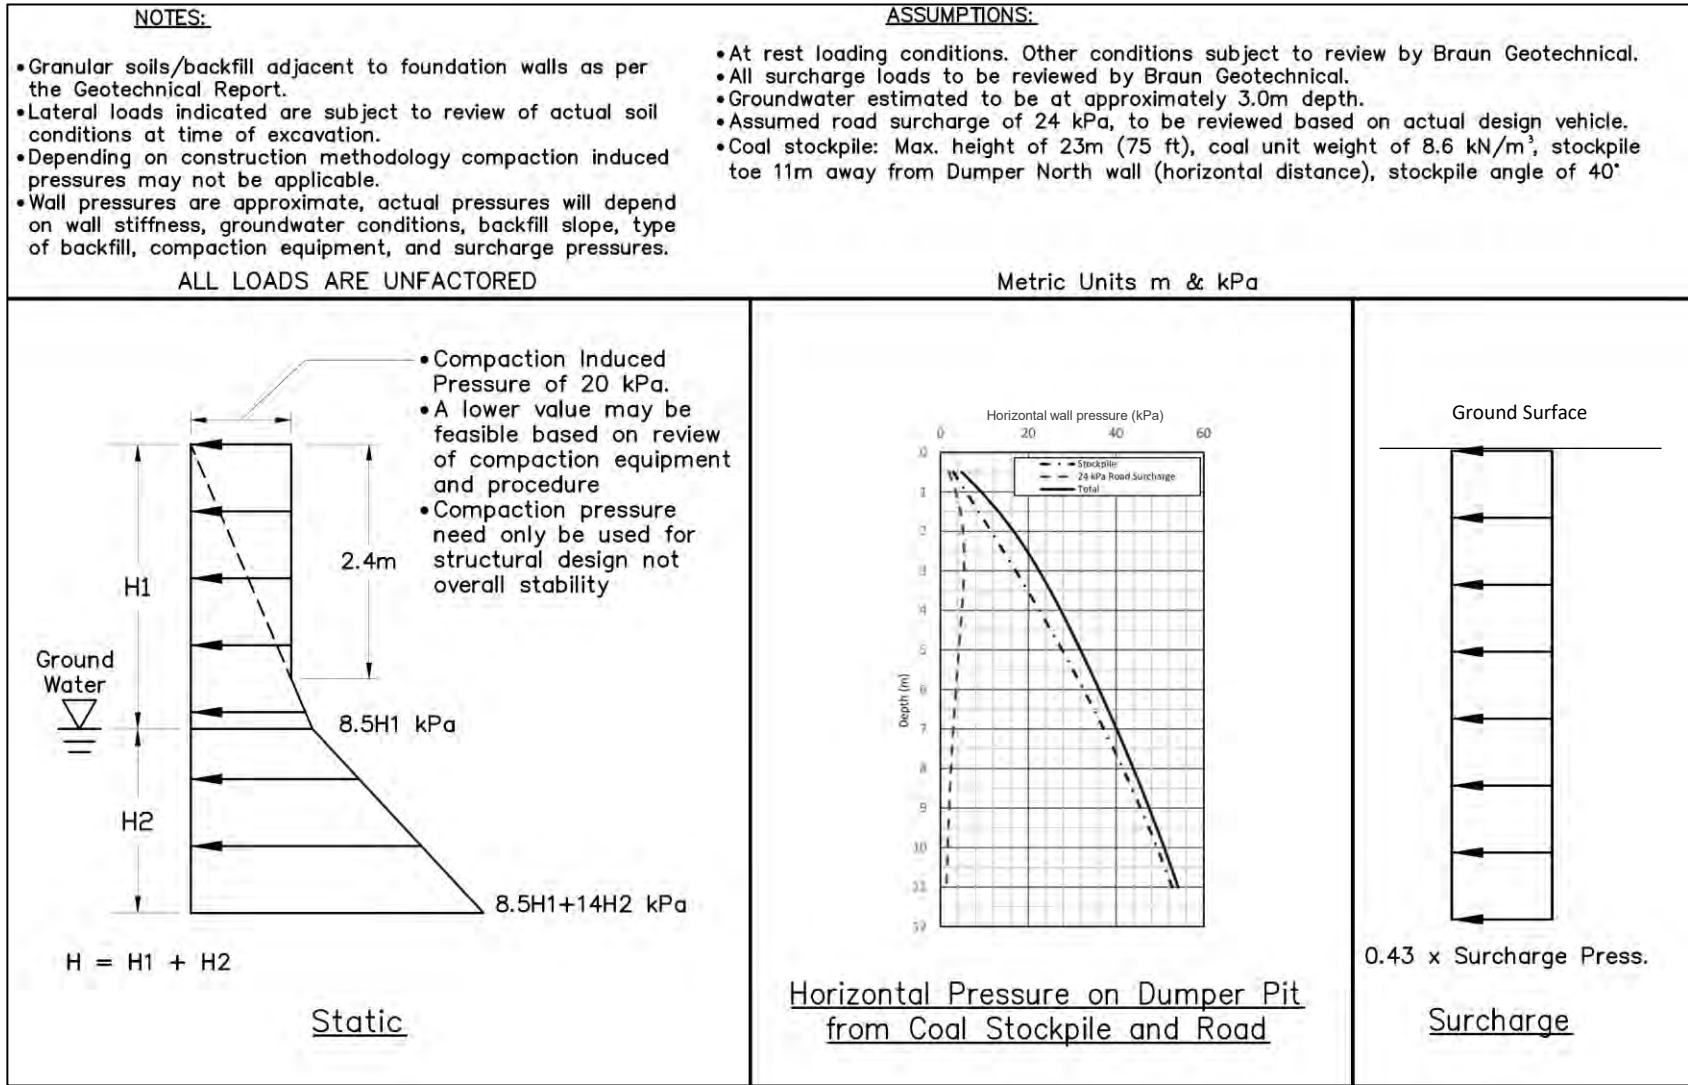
Static horizontal wall pressure diagram for east and west sides of dumper pit (at rest)
